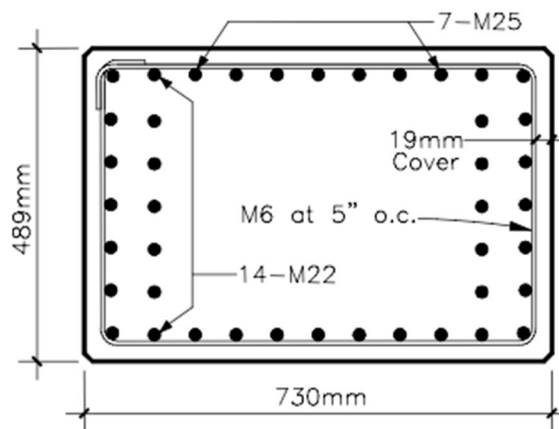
Reinforcement details of specimen R5 (Sun et al. 1993)
